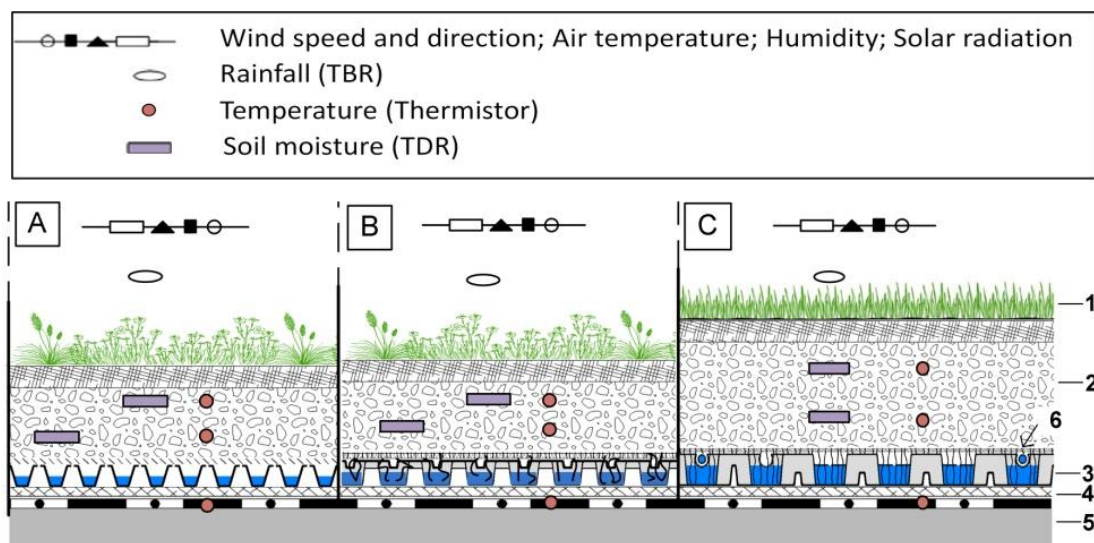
Cross section of green roof systems and the schematic representation of the sensors location: 1. Vegetation; 2. Substrate; 3. Drainage layer (with filter sheet on top); 4. Protection layers (consists of root-resistant and waterproofing layers); 5. Roof insulation foam; 6. Wicking mat.
